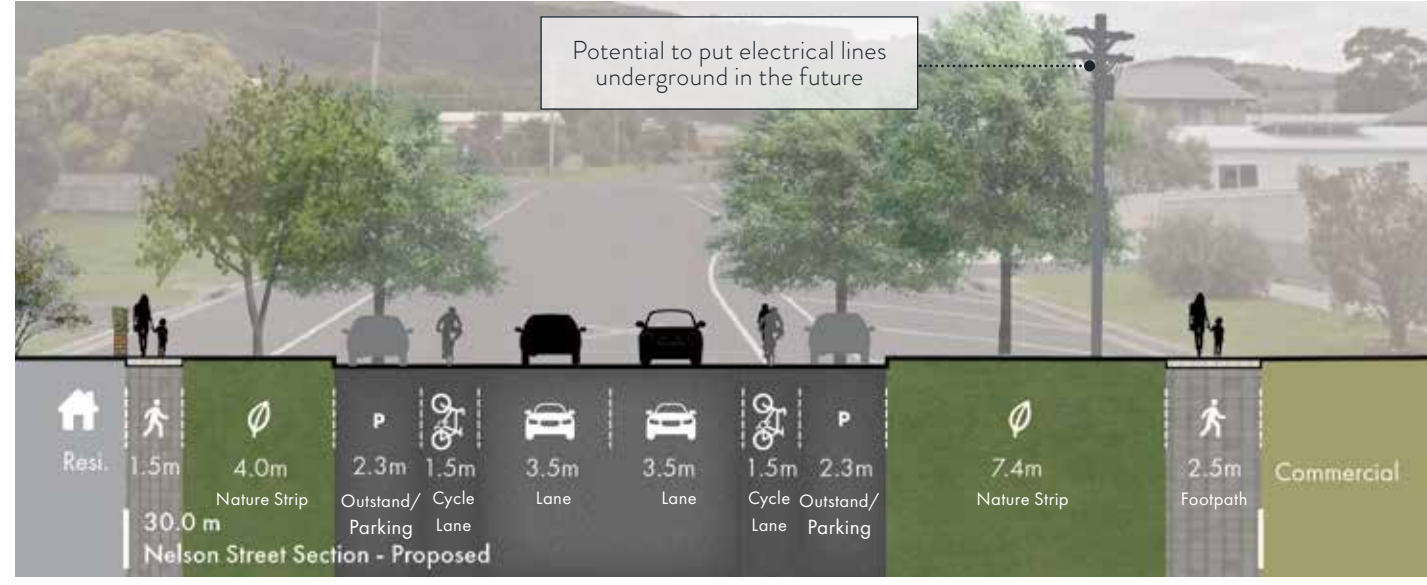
Nelson Street A-A' - Pascoe Street to Great Ocean Road - Proposed
